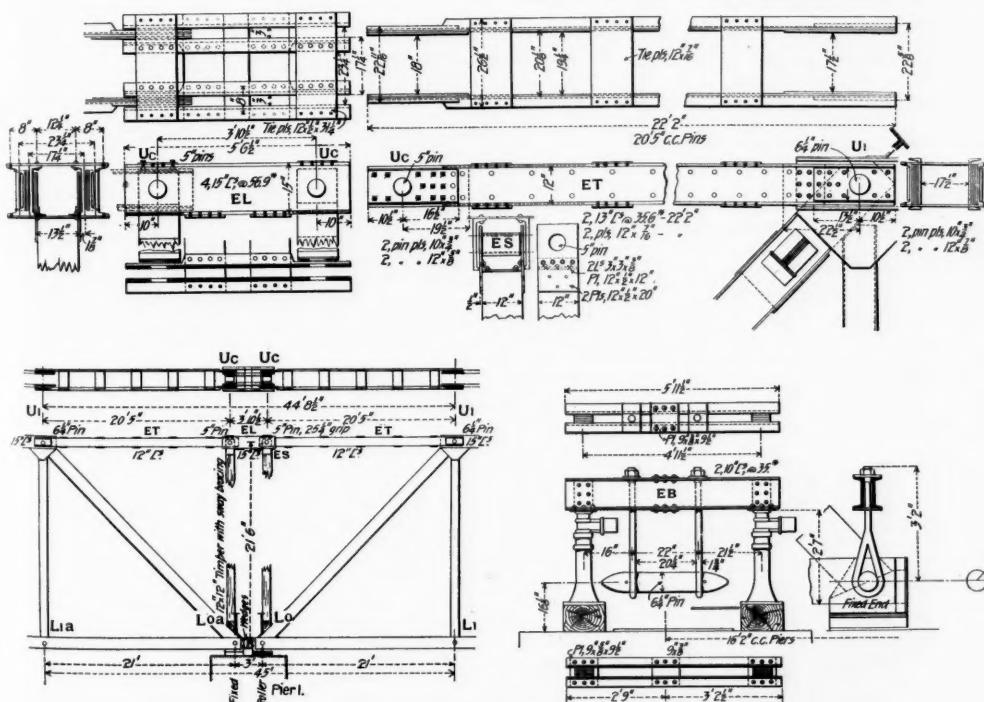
Details of Erecting Arrangements, Atbara Bridge.
